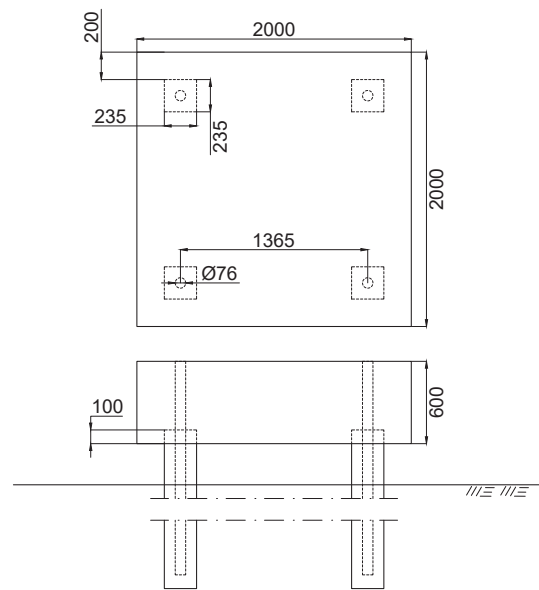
Dimensions in millimetres of the case-study pile foundation.
